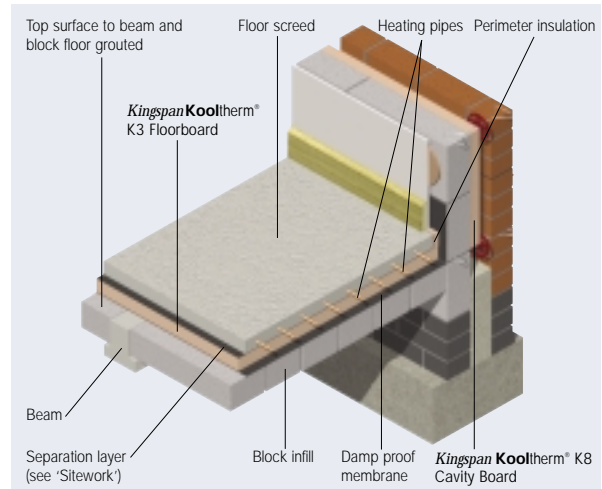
Underfloor Heating – Intermittent Heating Cycle Applications – Beam and Block Floor
